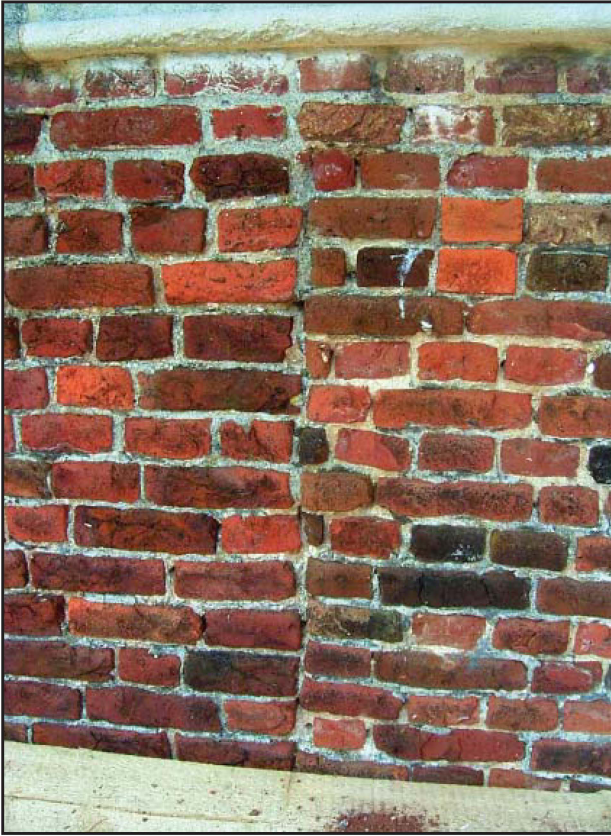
South elevation, external view, second floor, illustrating break between Tudor and 17th century brickwork used to infill primary windows
